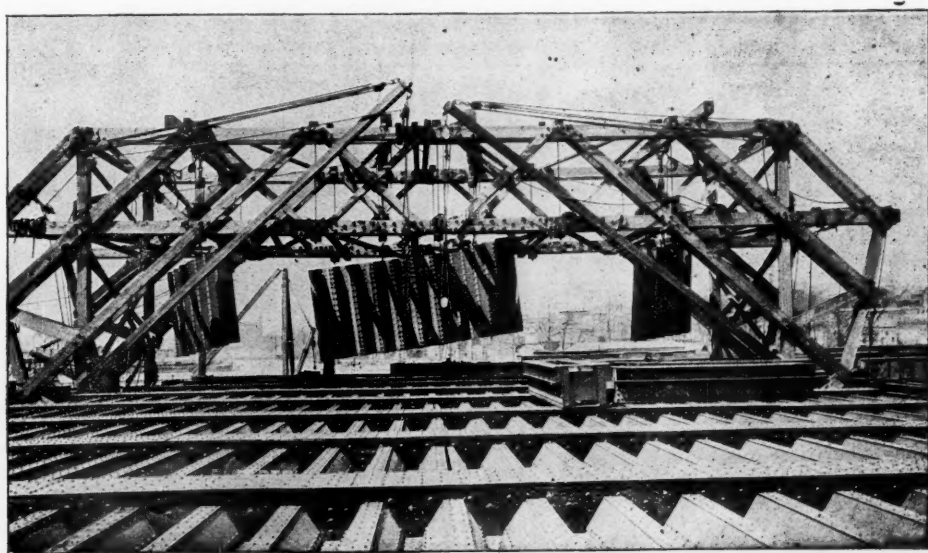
View of Promenade Street Bridge, Showing Trough Flooring.
